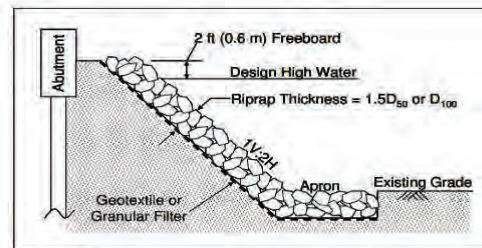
Typical cross section for abutment riprap (Lagasse et al. 2006).
